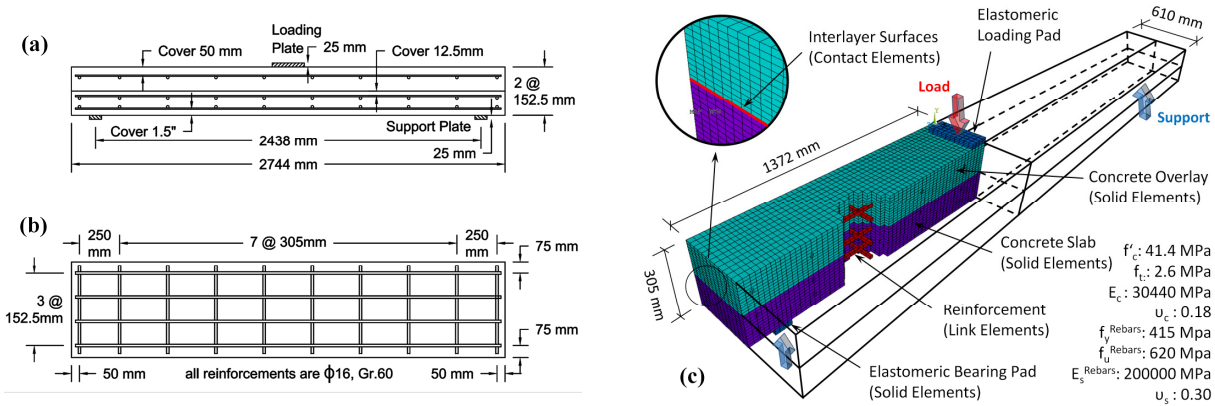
Reinforced concrete slab with overlay: (a) elevation, (b) plan, (c) proposed FE model
